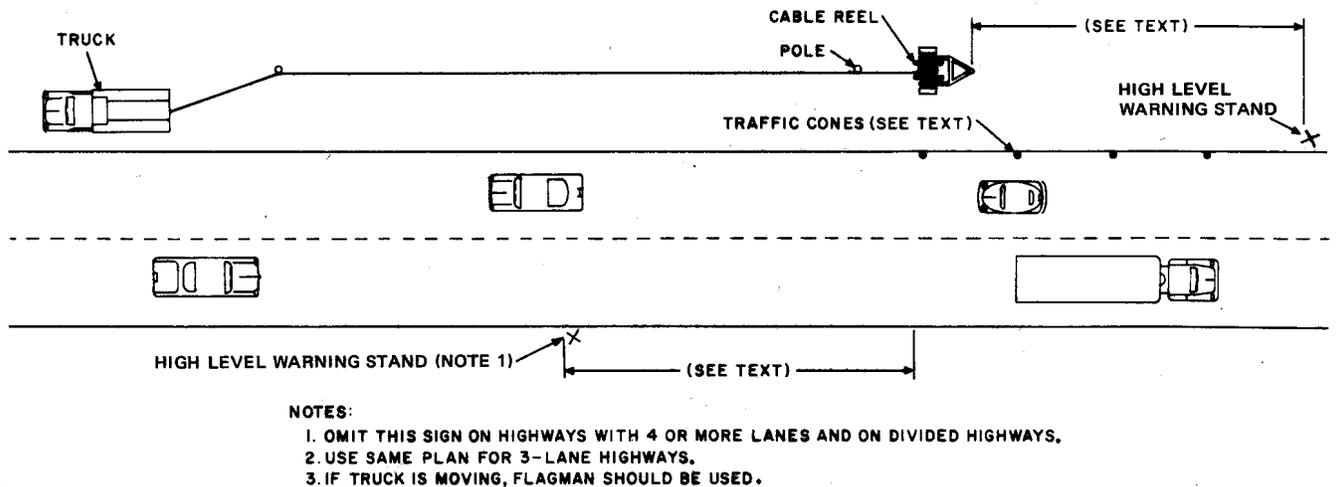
Placement of Warning Devices on Street or Highway - Stringing Aerial Cable on Shoulder
